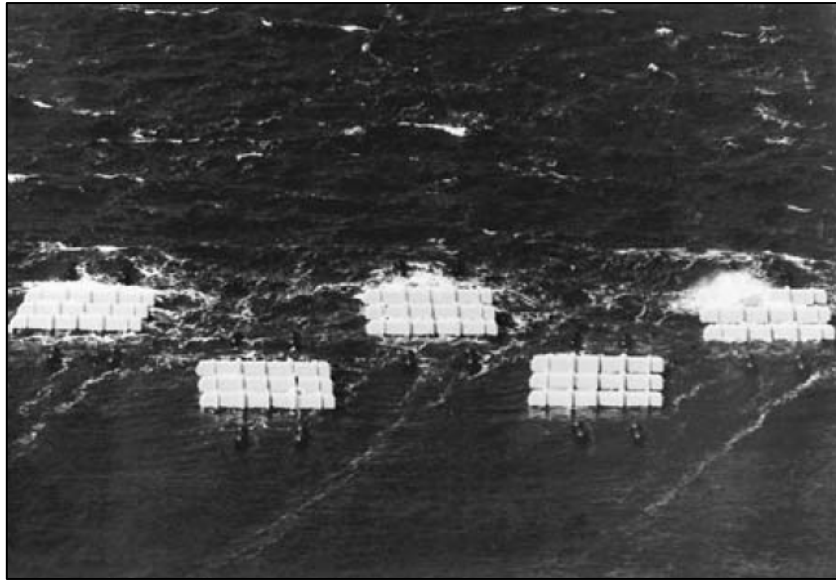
Bridgestone breakwater systems, Japan (Kato et al., 1979)
